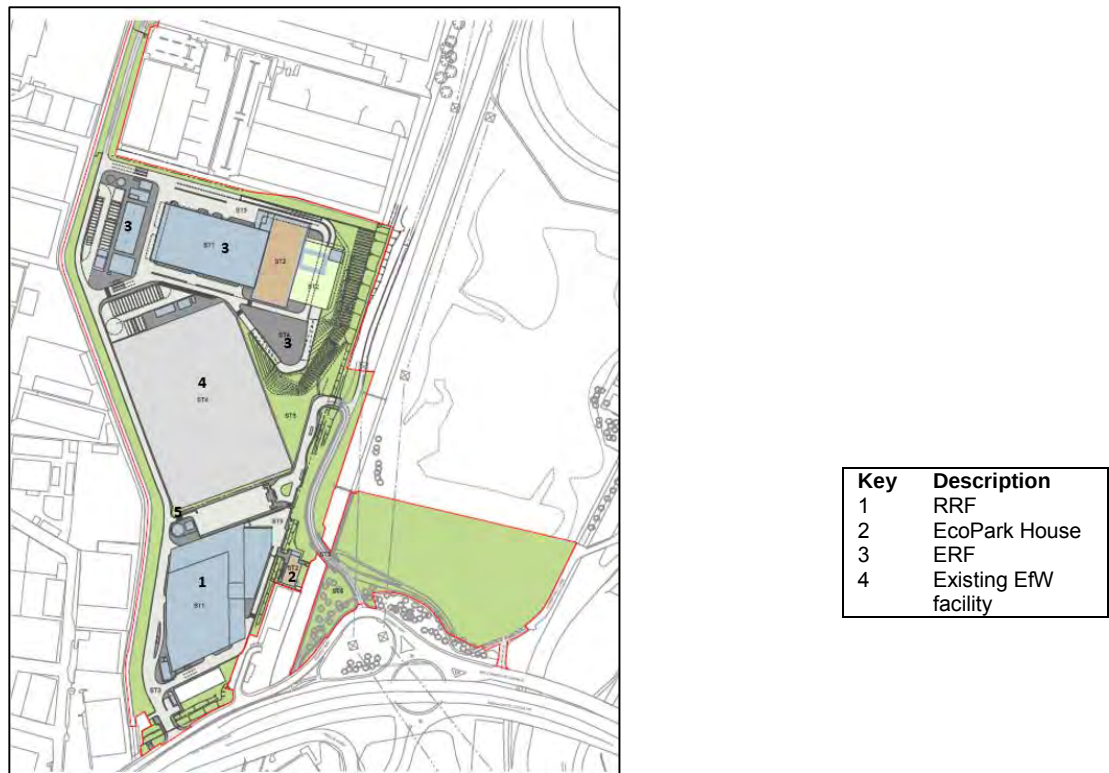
Schematic showing indicative impermeable areas of the final Edmonton EcoPark layout.
